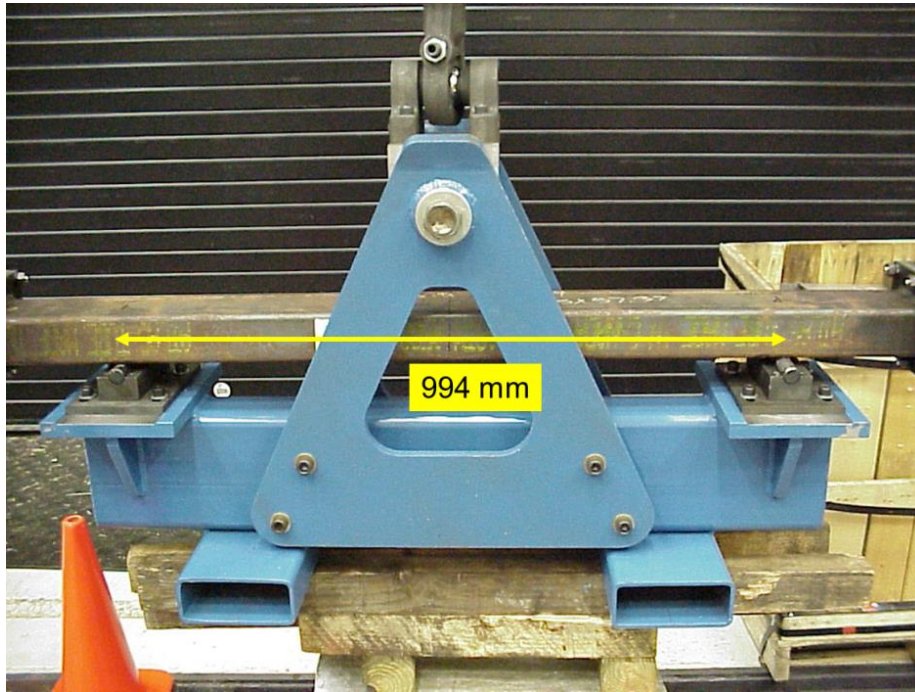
The fatigue test setup arrangement (closer view of the inside roller locations) – beam weldment
